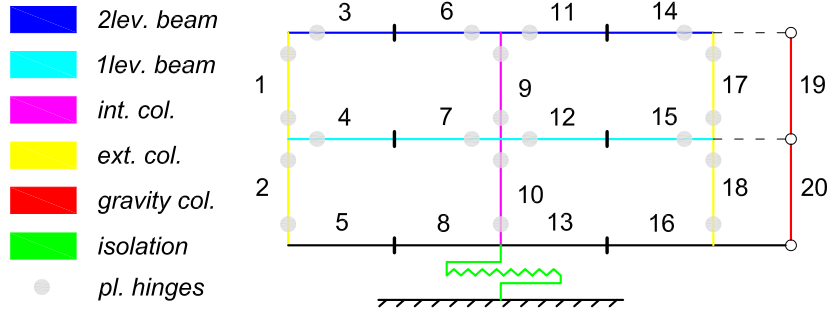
Frame example finite element model: element numbering, beam classes and plastic hinge locations are reported
